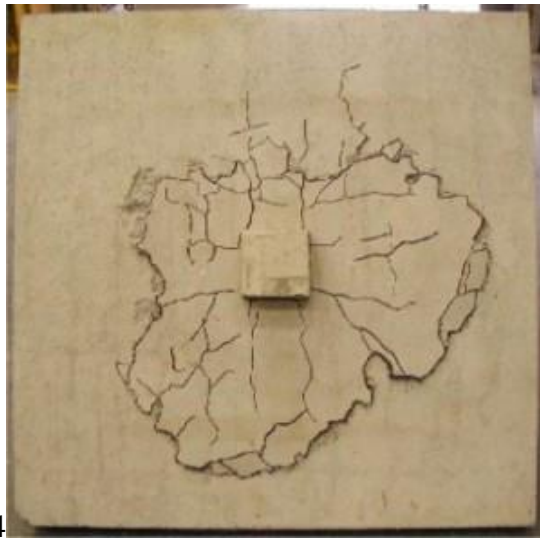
Plan View of Punching Shear Cracks in a Test Specimen at University of Waterloo, Ontario. (Curtis, 2013)
